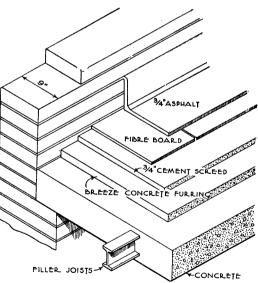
FLAT ROOF IN CONCRETE WITH ROOF INSULATION
